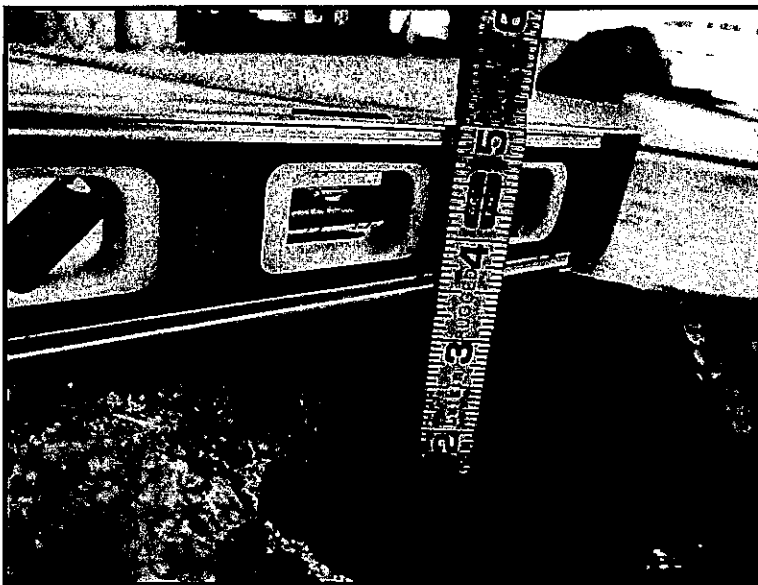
Approximate Depth Measurement of Concrete Failure
